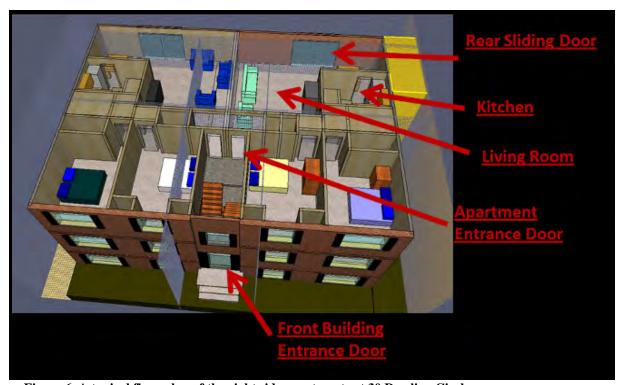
A typical floor plan of the right side apartments at 30 Dowling Circle.
